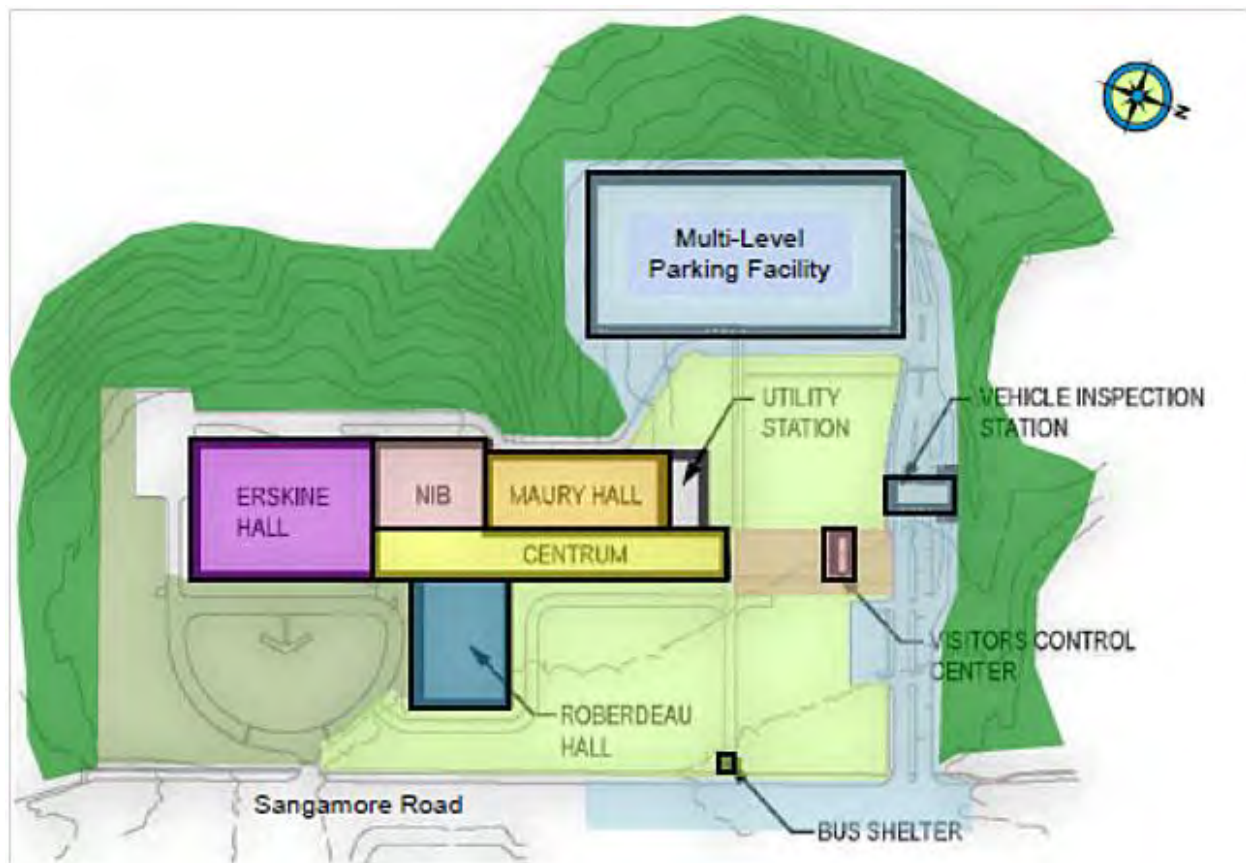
Generalized site plan as originally proposed for the installation (Erskine, Maury, and Roberdeau Halls are existing structures; the New Infill Building, or NIB, Centrum, parking facility, Entry Control Facility, Visitors Control Center, and bus shelter are proposed structures).
